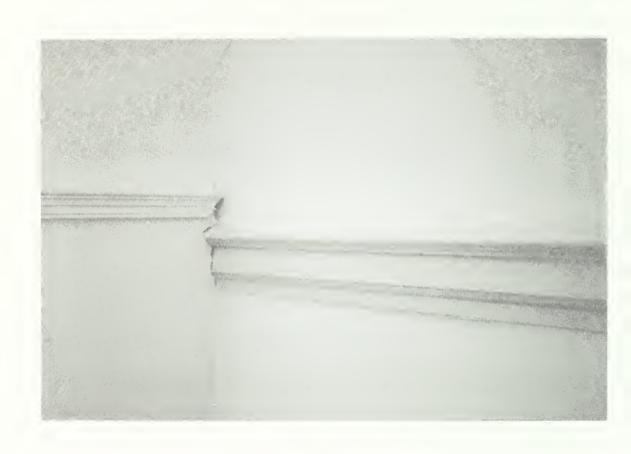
South chamber (Room 202), south end of west wall, chair rail at closet partition.
